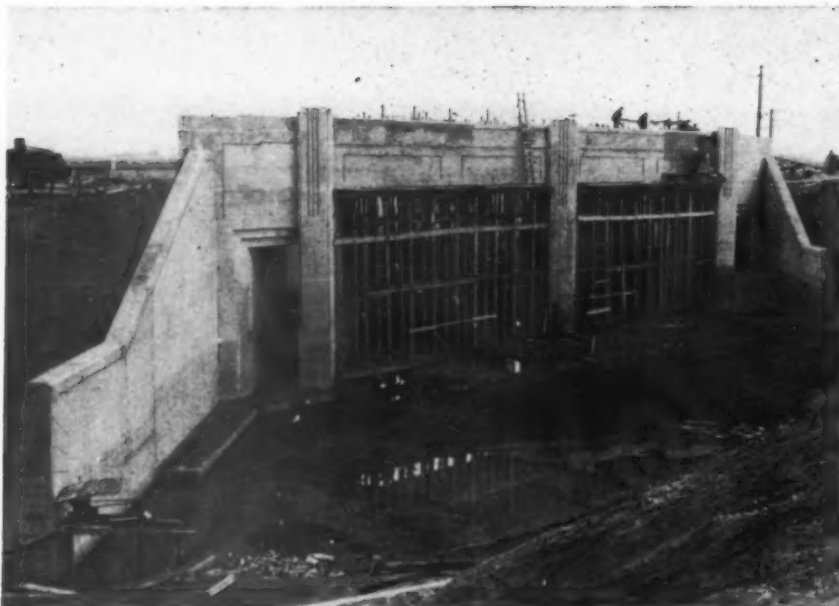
C. B. & Q. R.R. bridge showing centering for fascia girder. In left sidewalk tunnel may be seen brackets upon which sidewalk will be placed, while at right, sidewalk is already placed. Note electric dewatering pump at left in foreground
